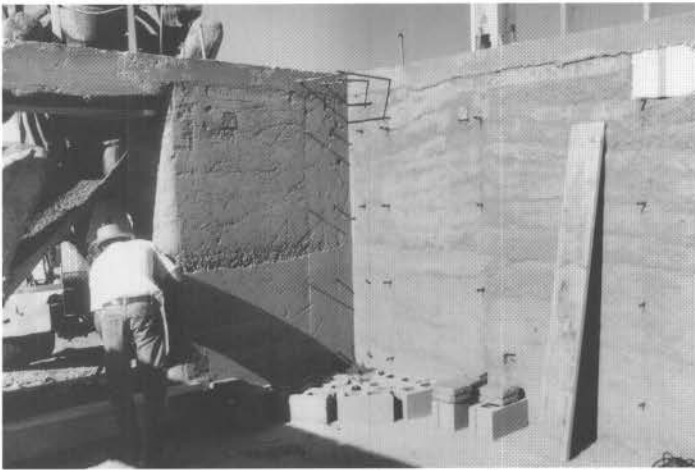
A rammed-earth home under construction east of Las Cruces by Soledad Canyon Earth Builders. Damp soil containing about 5% portland cement is compacted by tamping between forms. Note the layering in the wall after the forms have been removed. The workmen are pouring a concrete sill for a window.
